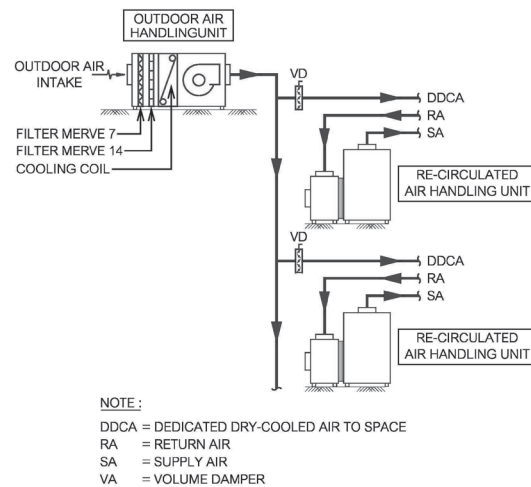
the design of dedicated outdoor air handling unit (OAU) in an air-conditioning system
